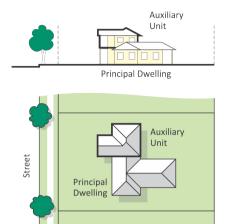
Layout of an Auxiliary Unit located above the Principal Dwelling
